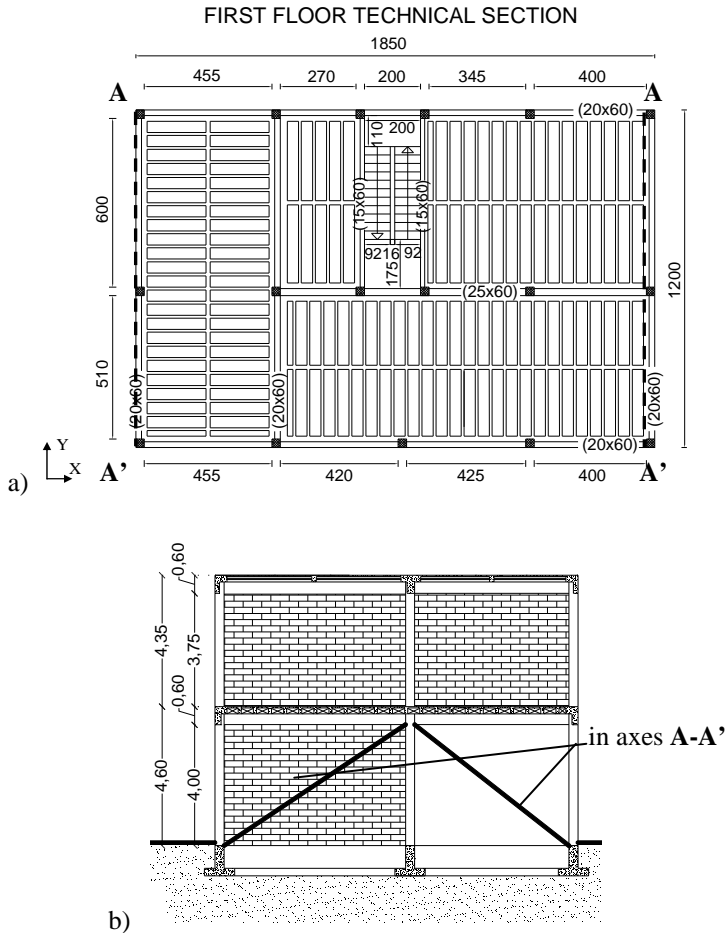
The building to be equipped with BRBs: a) structural plan; b) brace configuration.
